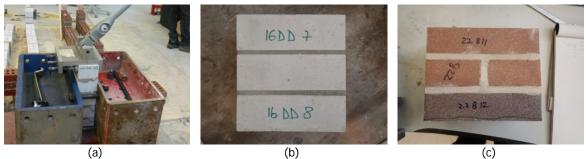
Specimens for bond wrench test: (a) five stack bonded bricks specimen; (b) three stack bonded bricks specimen; (c) sawn cut specimen.
